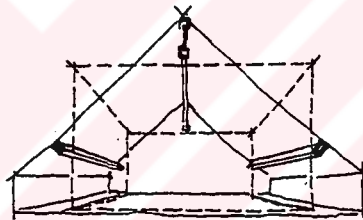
Dutch solution aims to recapture lost roof space in a steep pitch by means of long-span Stramit insulation.
